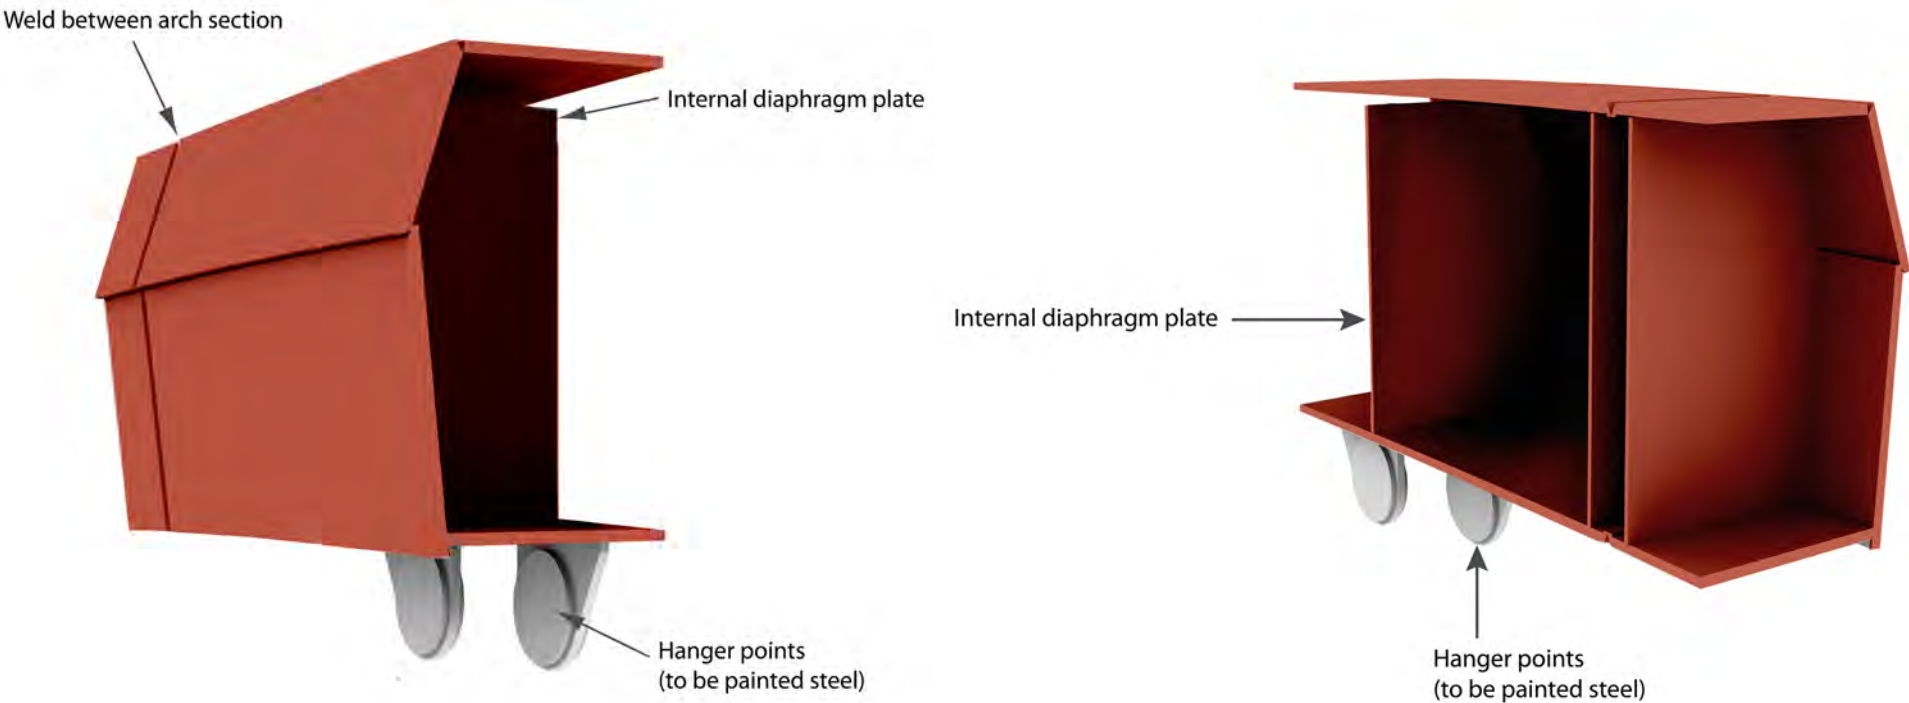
viii Assembly of elements making up the sample arch section shown in photographs below. The arch will be made up of 3 sections welded together; this weld (visible on these images) is of the same steel specification as the arch sections, and hence will gradually weather to the same colour. Also visible on the photographs is an inconsistency of tone resulting from the internal diaphragm plates; this too is a temporary effect.
